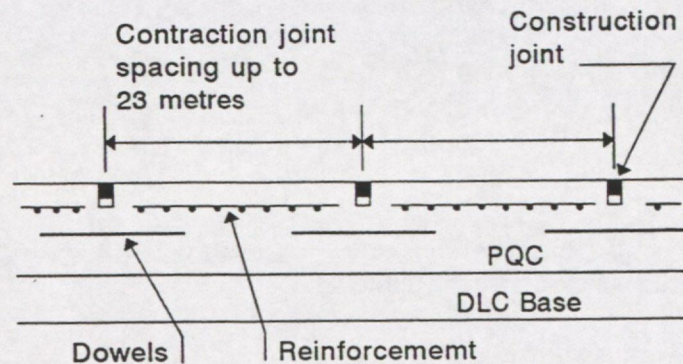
Typical longitudinal section through a jointed reinforced concrete pavement
